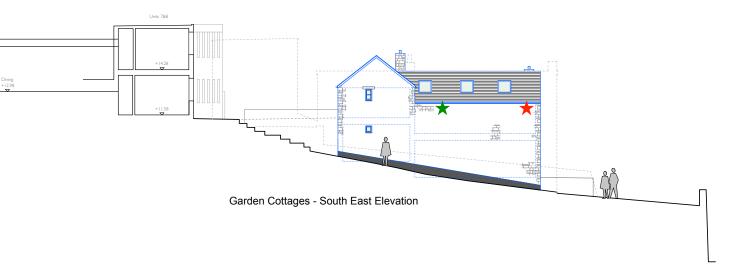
South east elevation as proposed showing location of bat box \bigstar and sparrow terrace \bigstar .
